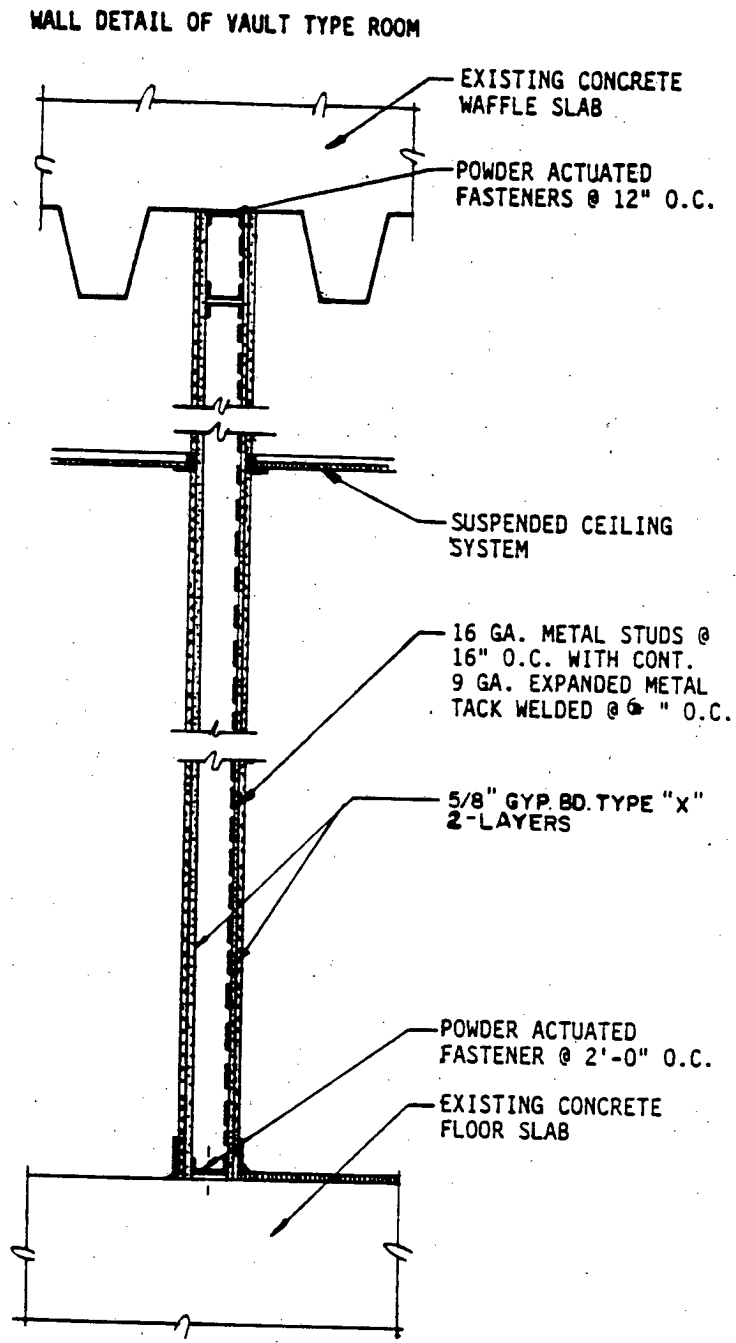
GYPSUM BOARD AND METAL VAULT WALL CROSSECTION
